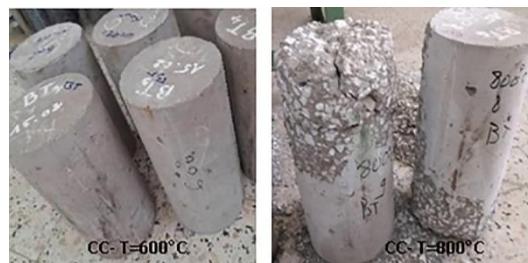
The appearance of the cylindrical specimens of the control concrete (BT) at the exit from the oven
